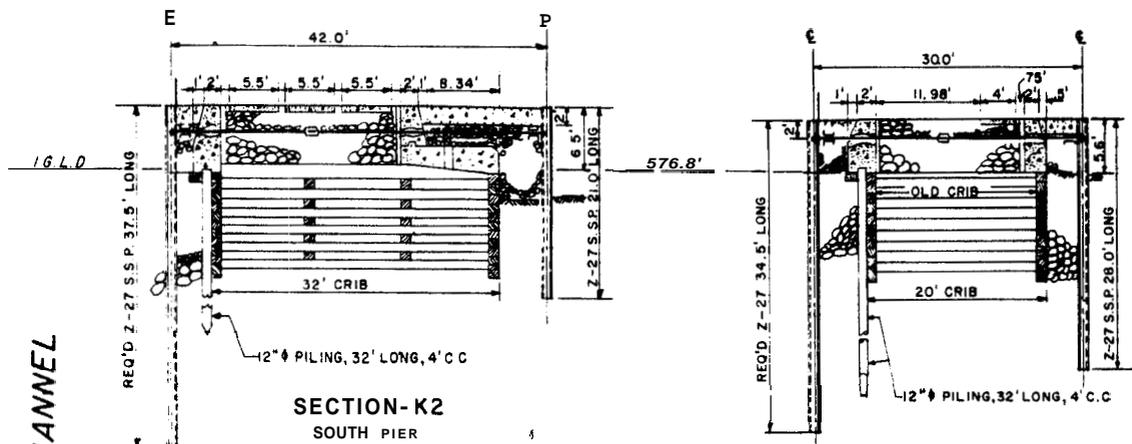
Typical south pier cross sections, South Haven Harbor, Michigan
